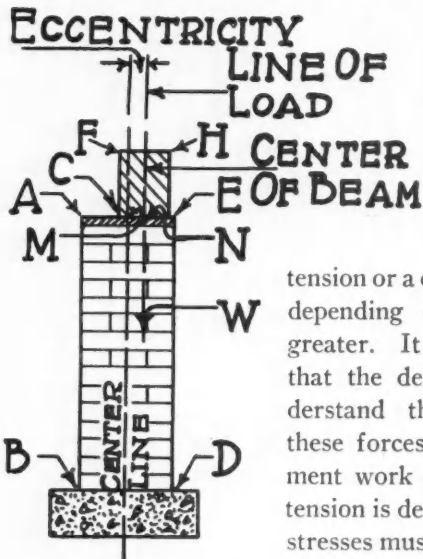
Brick Pier Resting on Concrete Foundation, Carrying a Beam That Is Not Placed in the Center.
